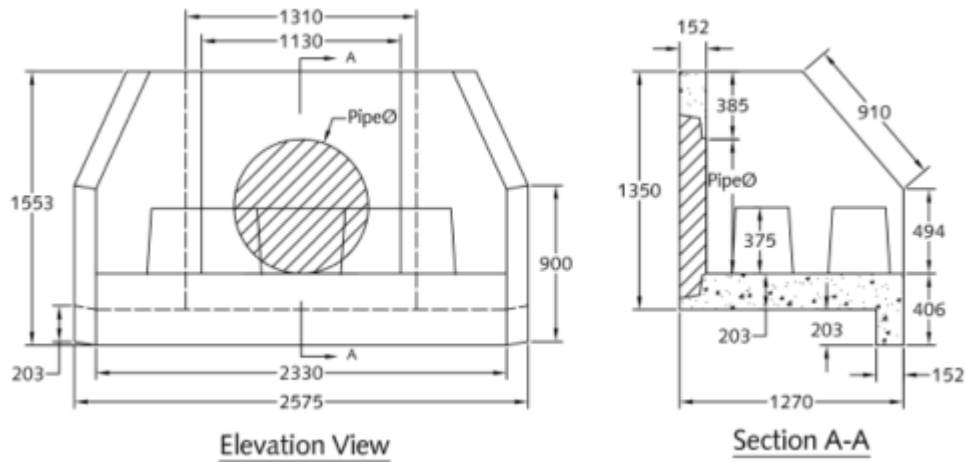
Prefabricated Concrete Headwall Unit [6].
